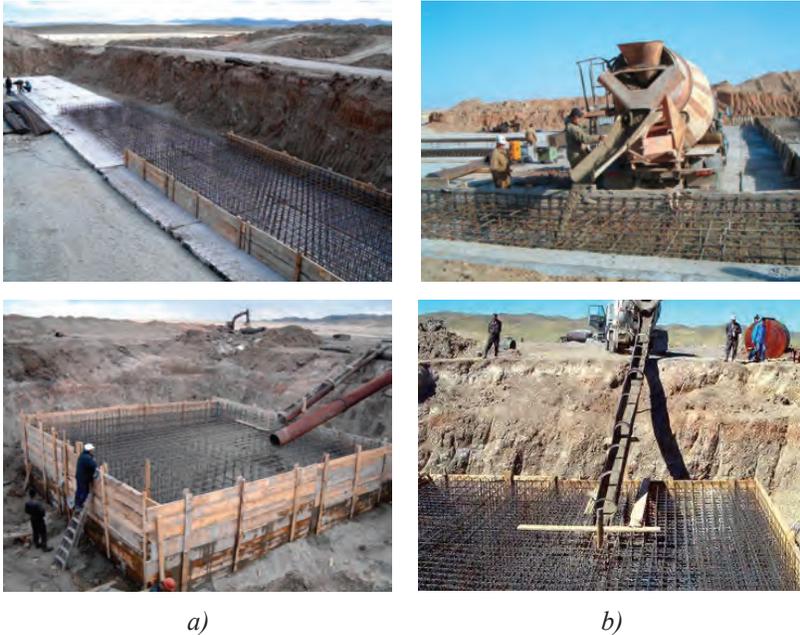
Formwork enclosure (a) and concrete laying (b)
